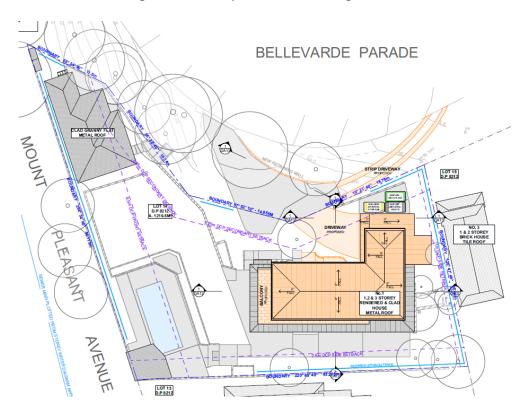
Extract from plans showing the new crossover, driveway across road reserve and onsite driveway (Drawing DA04)
